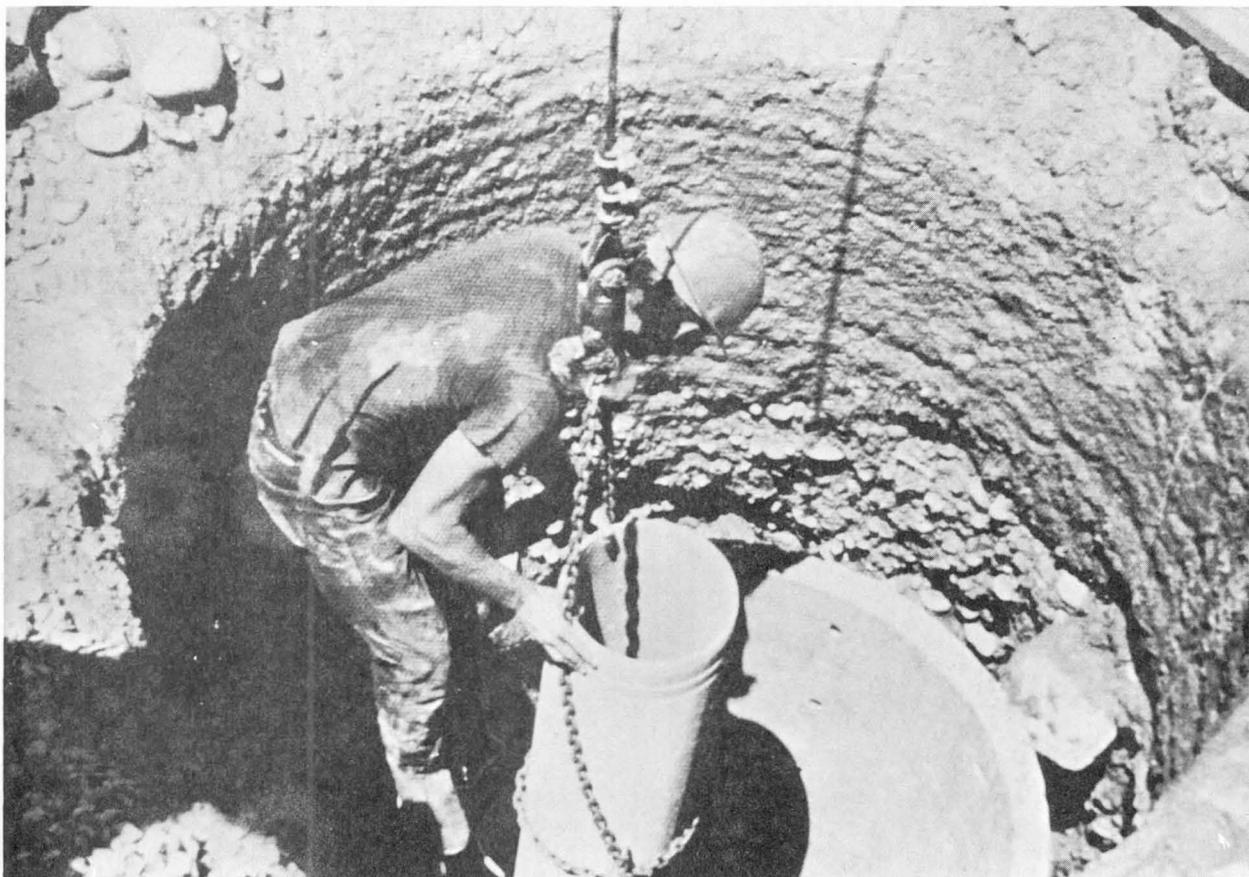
INSTALLATION OF OVERFLOW PIPE BETWEEN SETTLING CHAMBER AND DRY WELL
